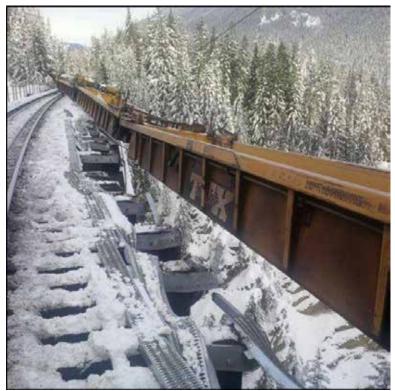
Derailed cars on the Stoney Creek Bridge (view looking west) (Source: Canadian Pacific Railway)
